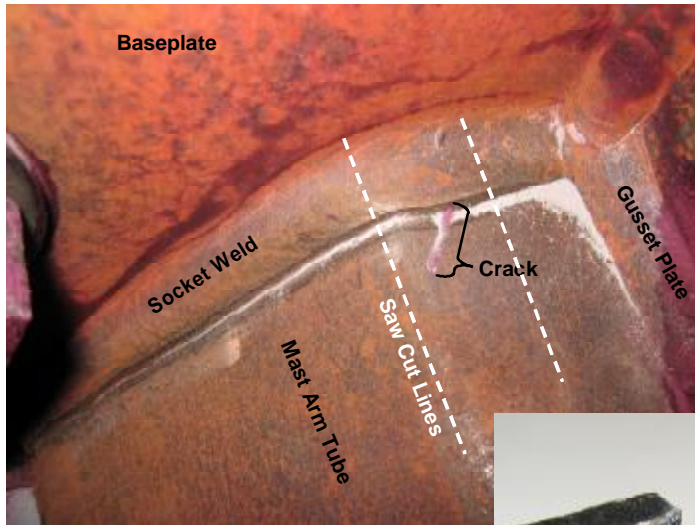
Seam weld crack in gusset-stiffened specimen.
